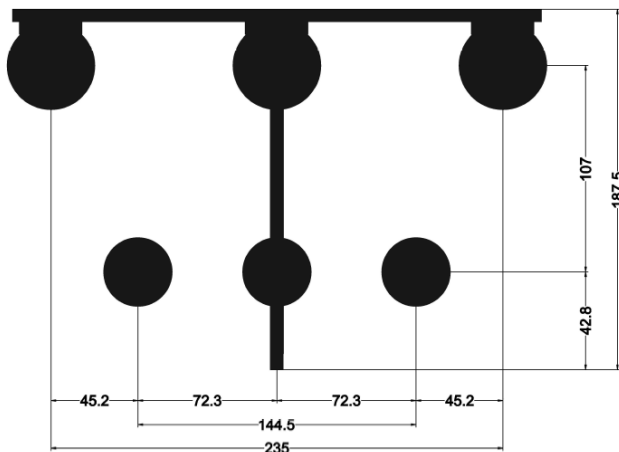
Extended 1 Numerical Model Cross-Section Dimensions. (All dimensions given in the figure are in millimeters.)
